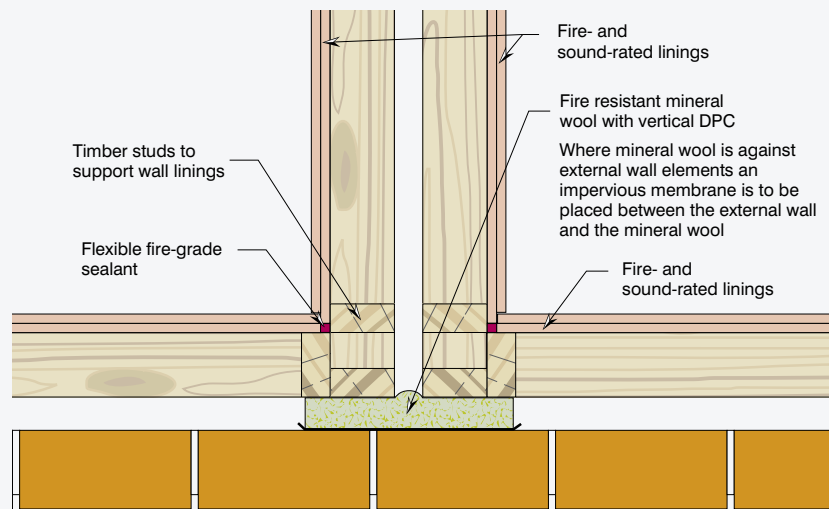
Cavity barrier (using mineral wool) at the junction of fire-rated bounding wall and external wall – plan view.
